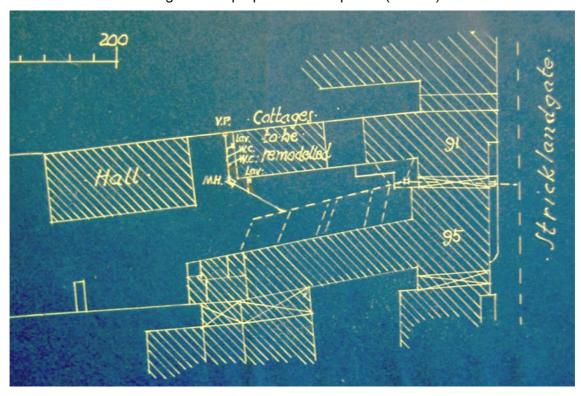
Planning application 1938 (CRO(K) WSMB/K11/S429)
